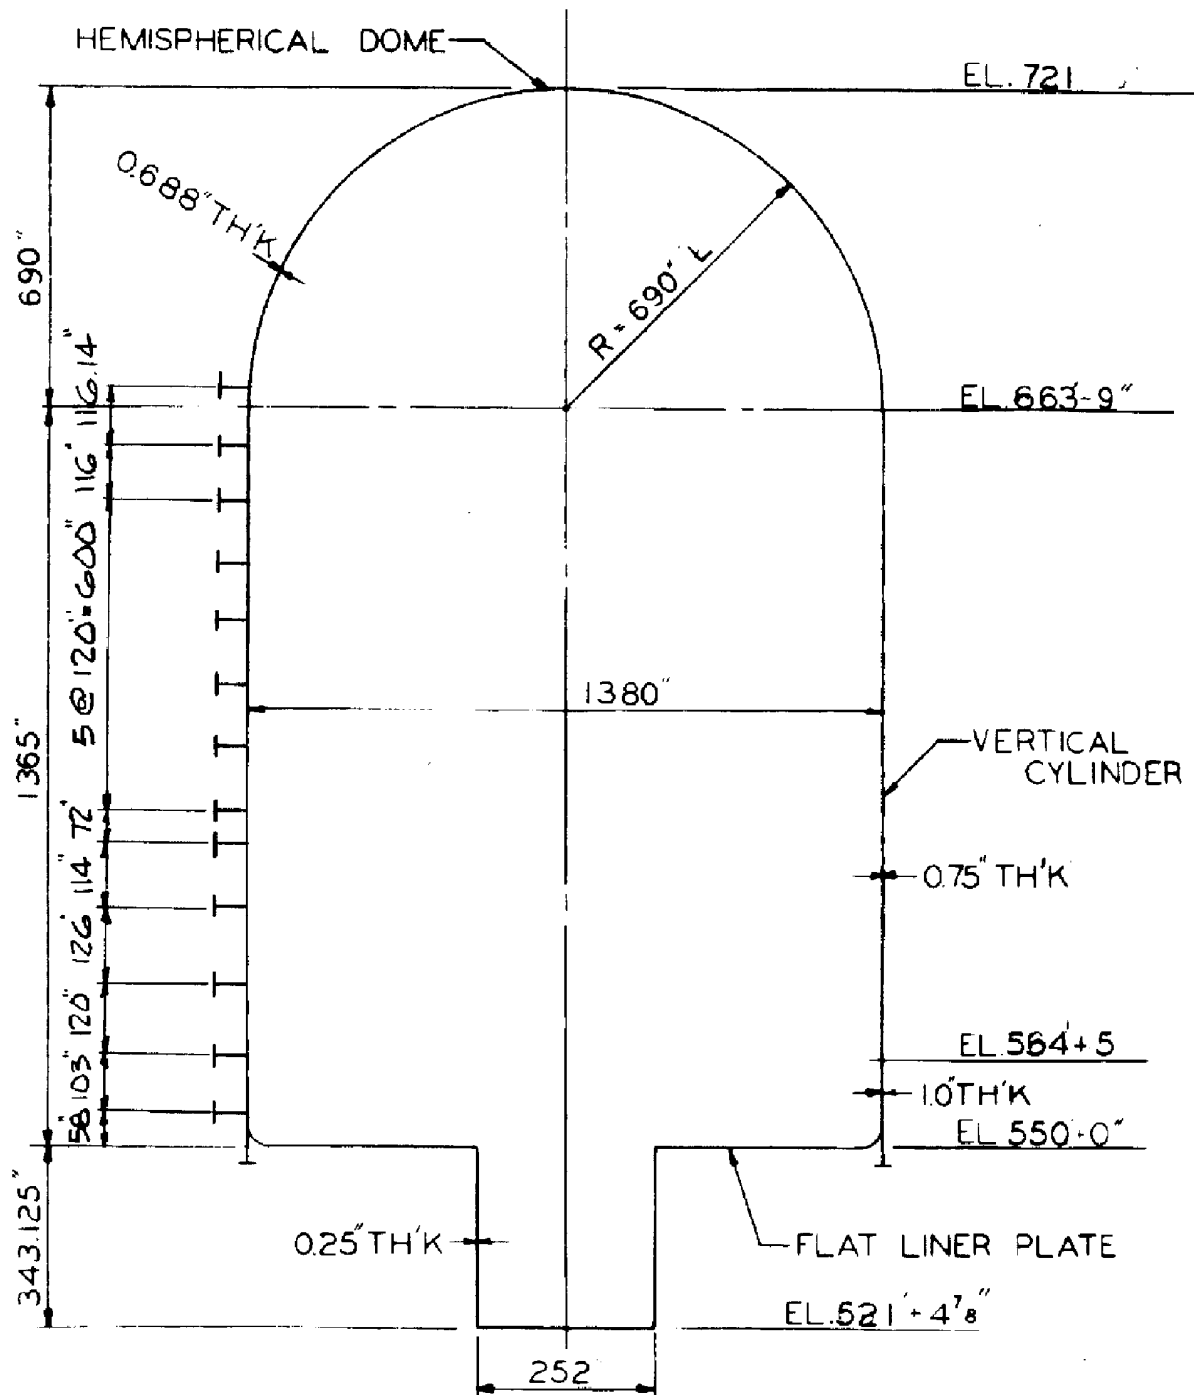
Reactor Building Shell And Crane Wall (Reinforcement Details)
